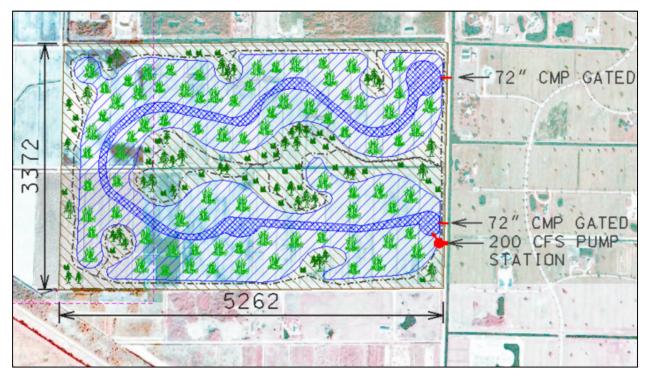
Section 24 Stormwater Detention Wetland and Upland Areas
